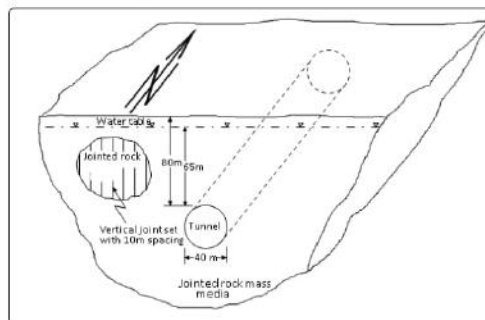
Geometry of circular tunnel excavated in jointed rock mass
